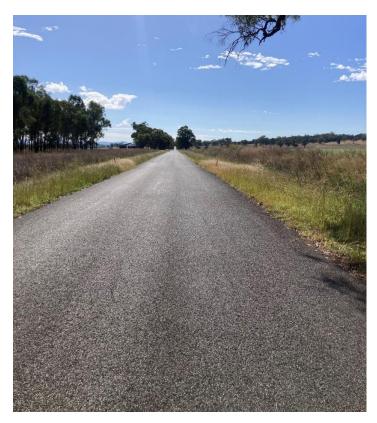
Looking East from Site Entrance (Source: Pace Farm)
